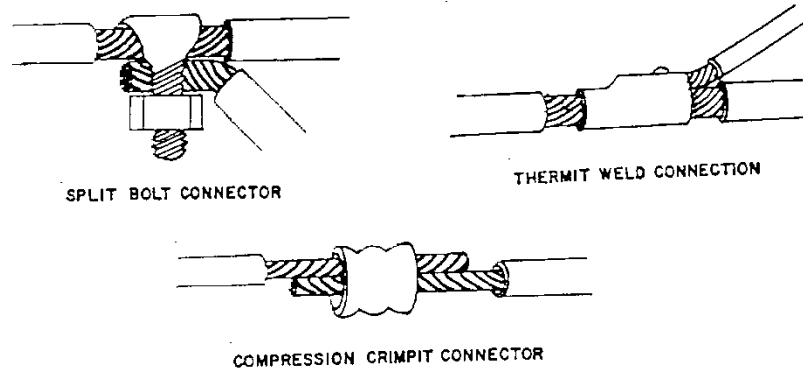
TYPICAL TYPES OF SPLICE CONNECTIONS
